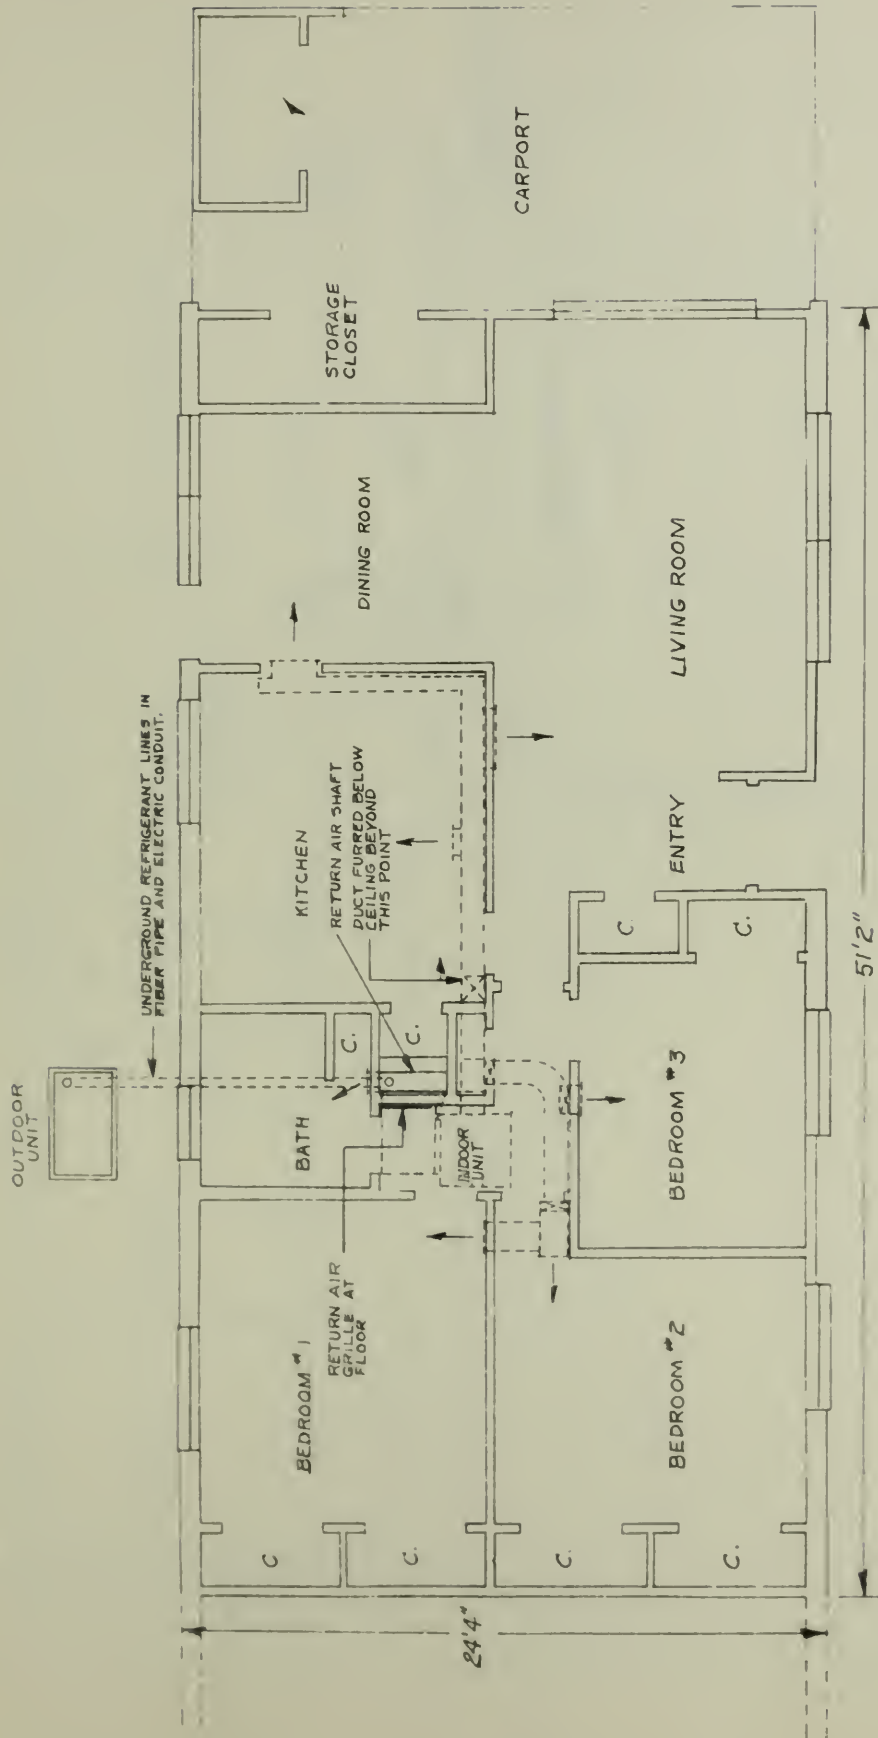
Plan View of Type D House, Seymour Johnson Air Force Base
